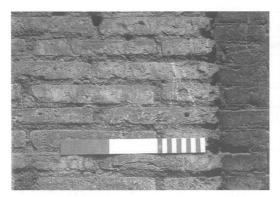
Sant'Andrea della Valle: example of filled and engraved curtain wall (17th cent.)
